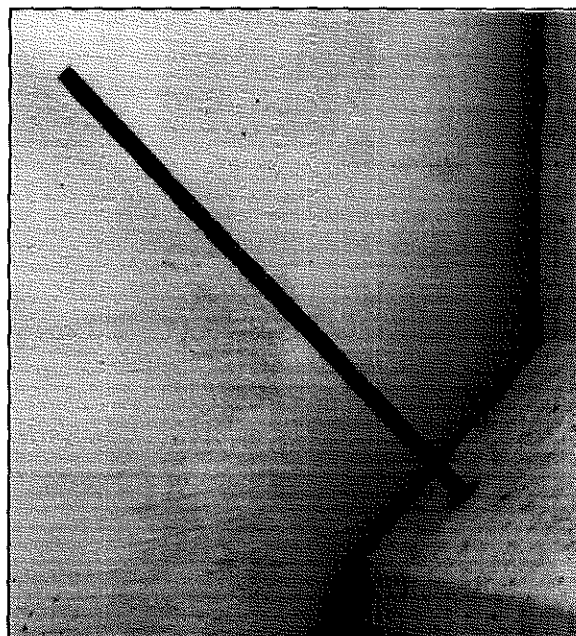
Diaphragm Anchor Bar in Place at the Abutment.
